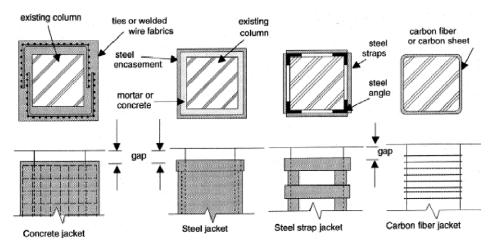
Techniques for strengthening retained columns where column spans are increased
